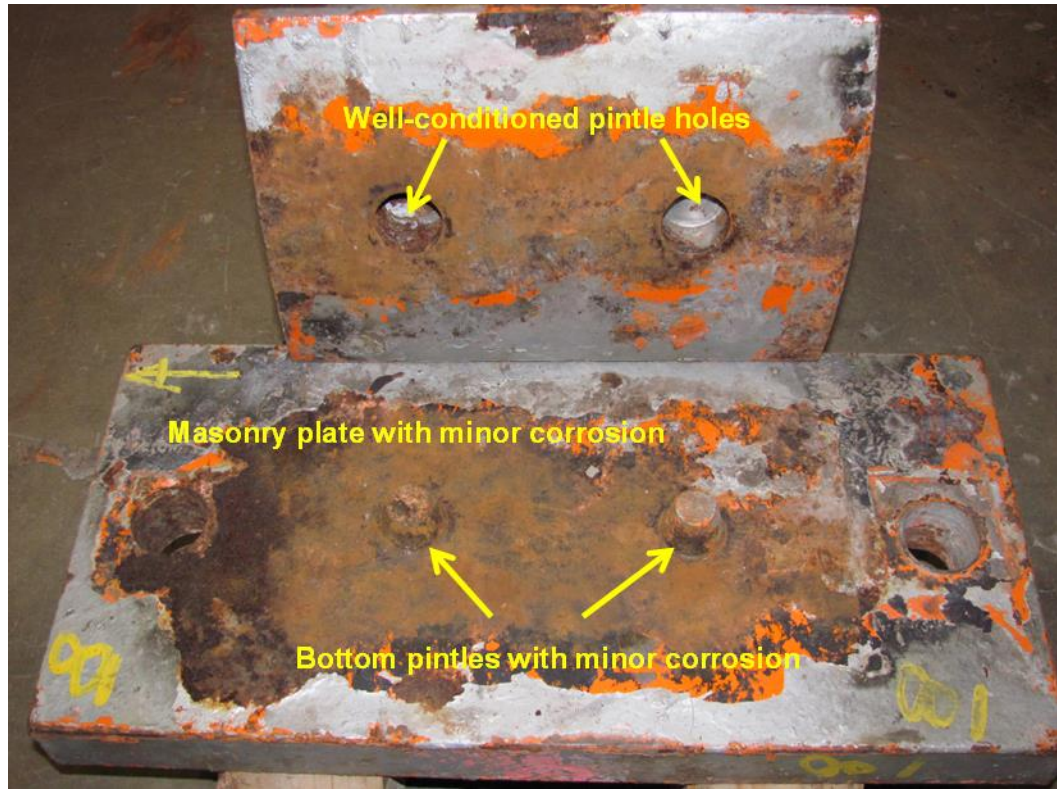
Bottom contact interface of Bearing PR8 in the as-received condition
